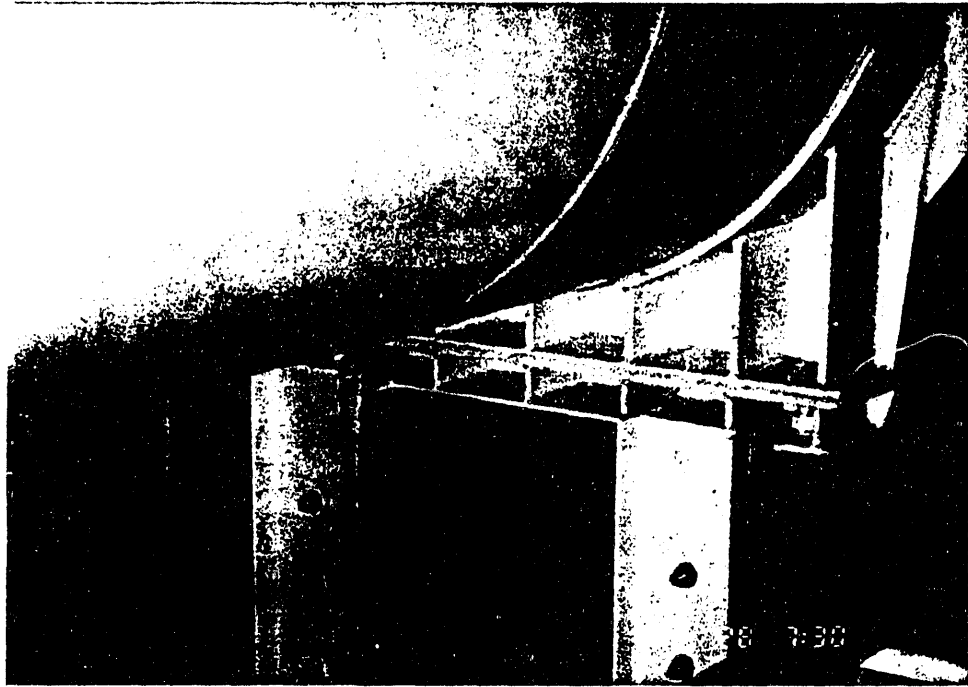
Anchorage Details at the Concrete Pier of Lower CCW Heat Exchanger
